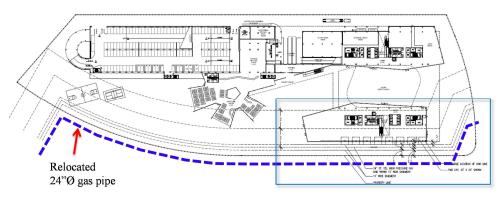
Site plan sketch and proposed location of natural gas pipeline
